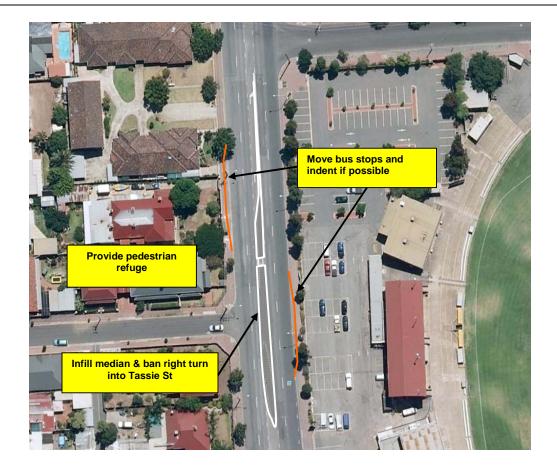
Proposed Brighton Road / Tassie Street Improvements
